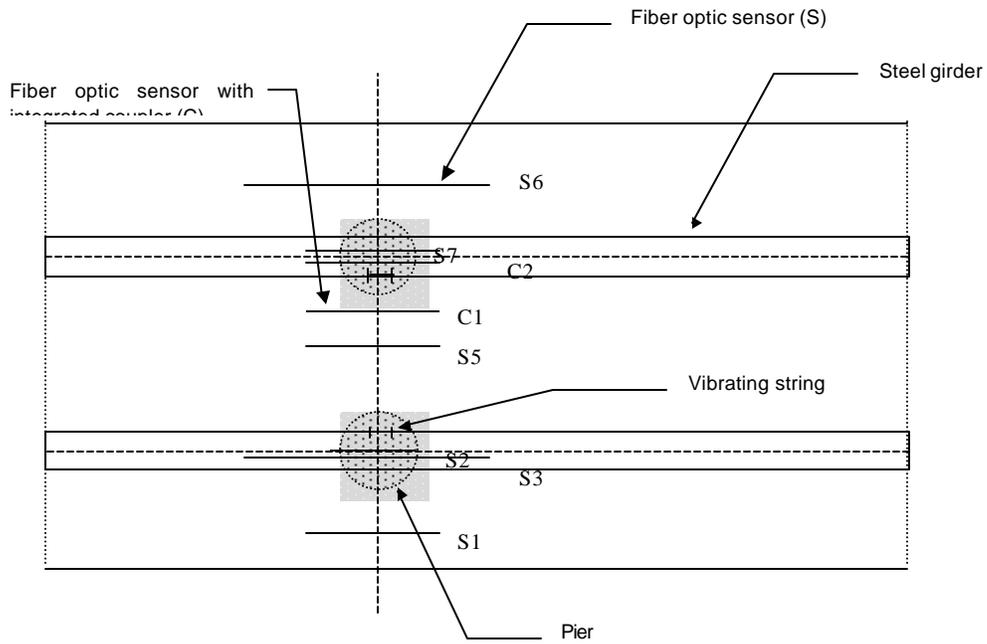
Section 3: Fiber optic sensor and vibrating string sensor emplacement
